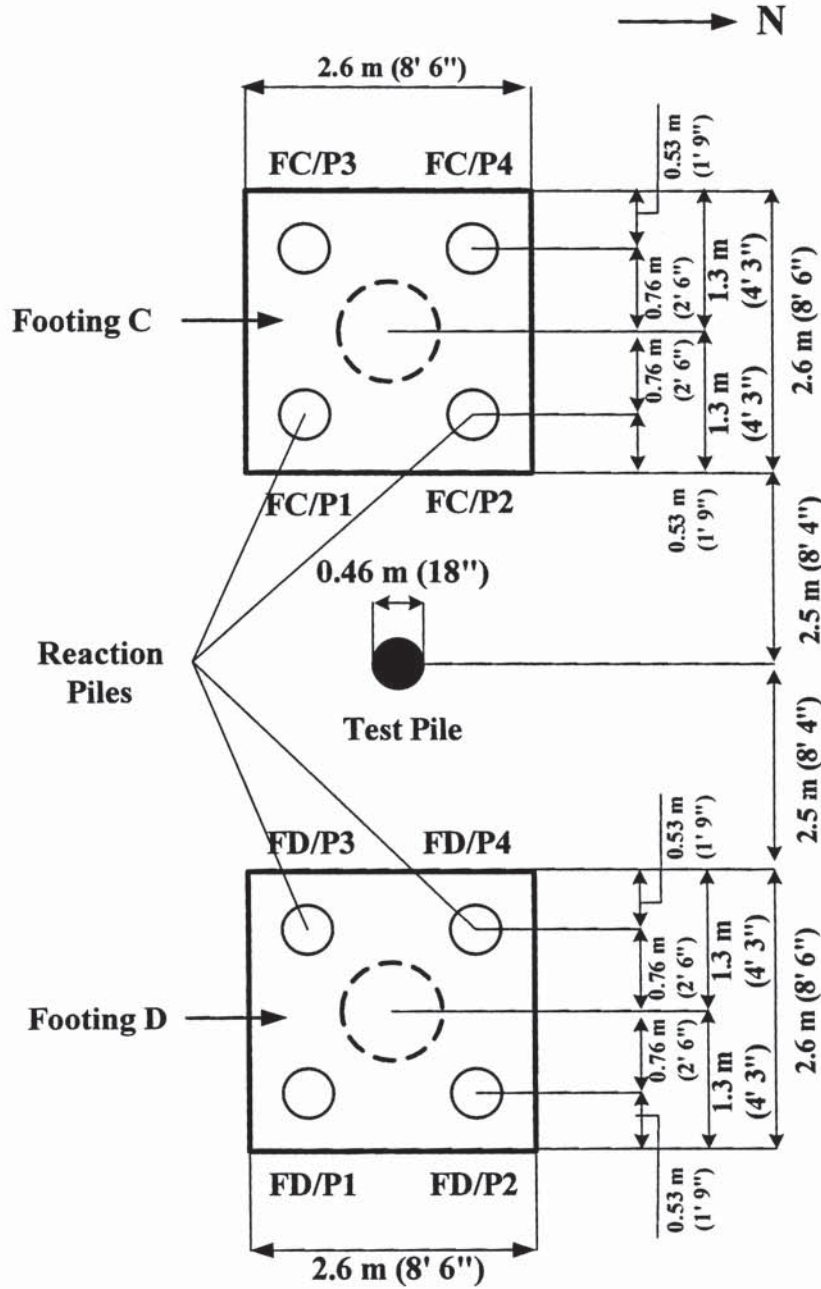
Layout for the Test Pile and Reaction Piles at Krenek Road Site
